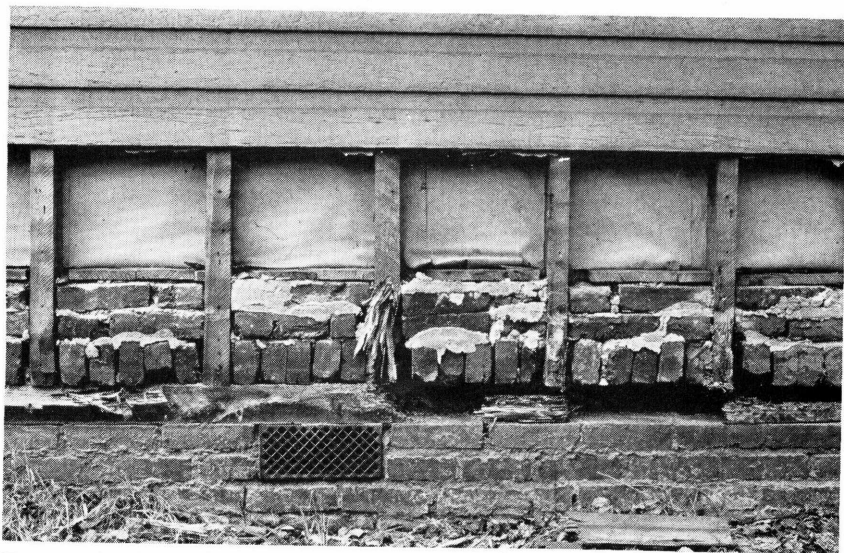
Termite damage to the sill and studding of a building. Having bricks between the studding is undesirable.
